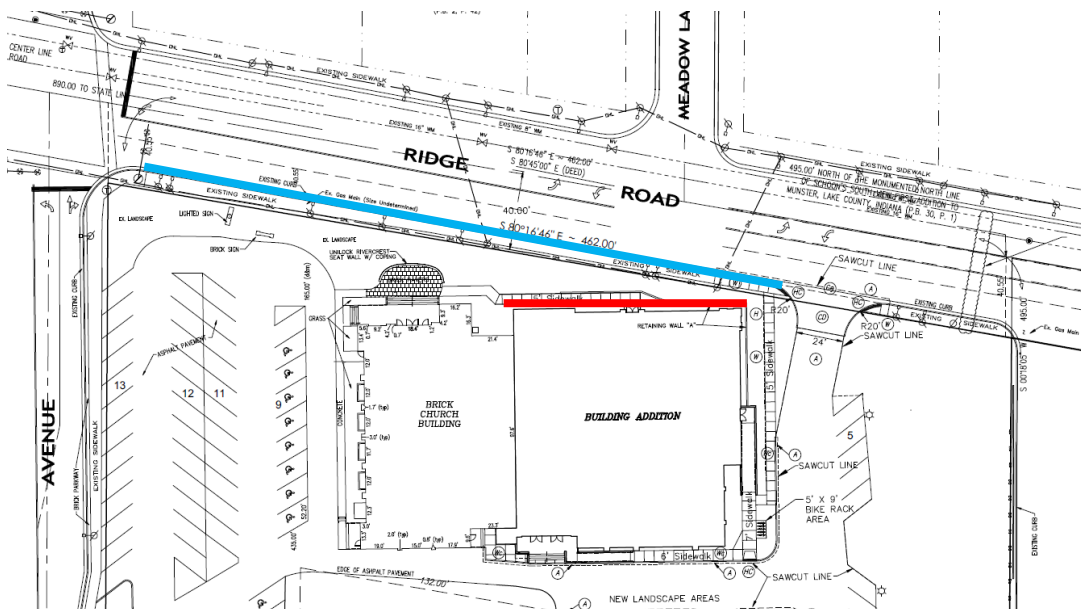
Building facade position shown in red; Ridge Road Frontage line shown in blue
